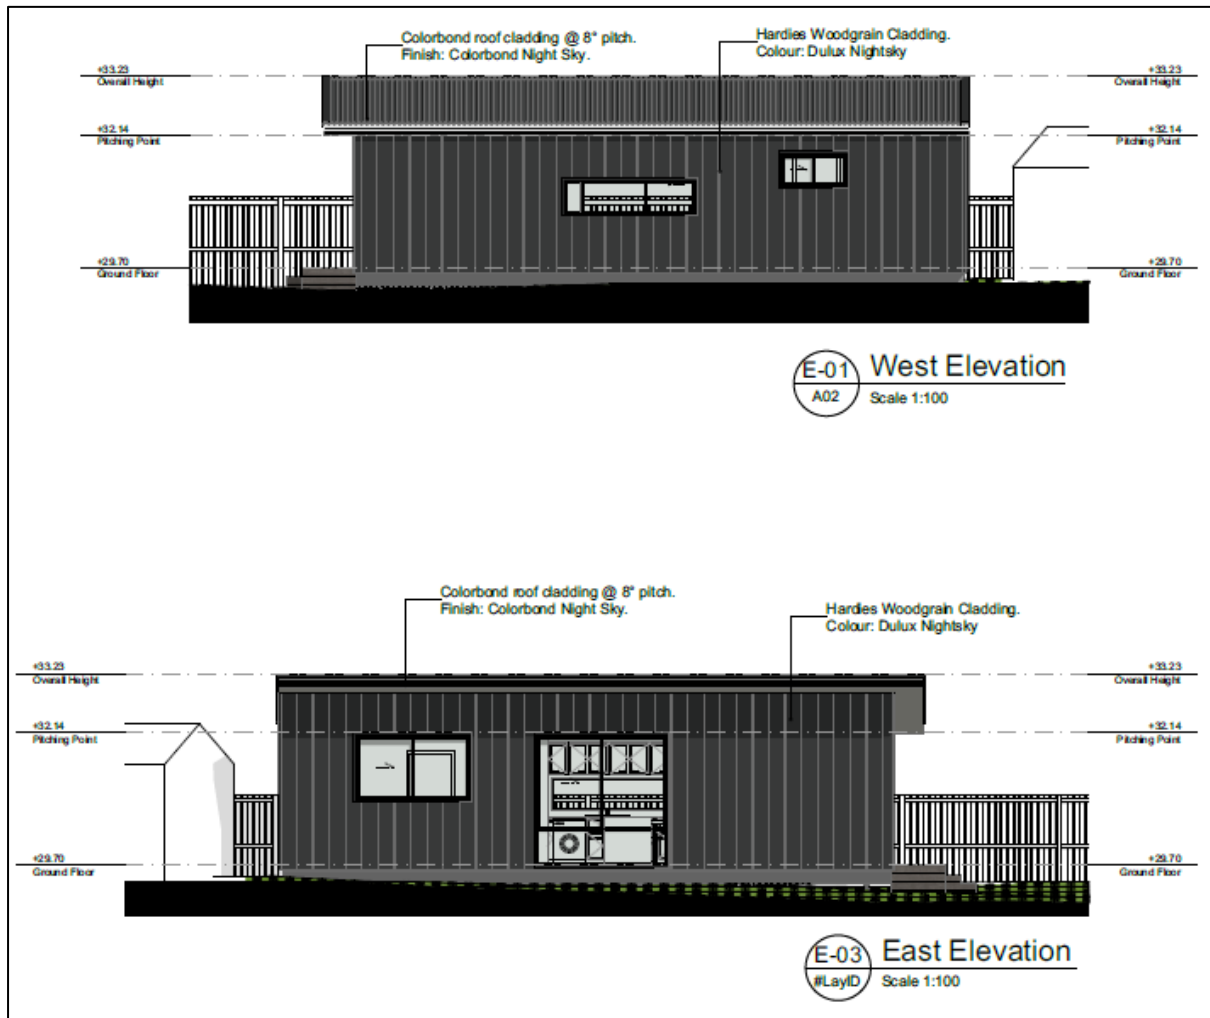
Elevations Plan of west (top) and east (bottom) elevations – Secondary Residence (Source: Spectura Studio).
